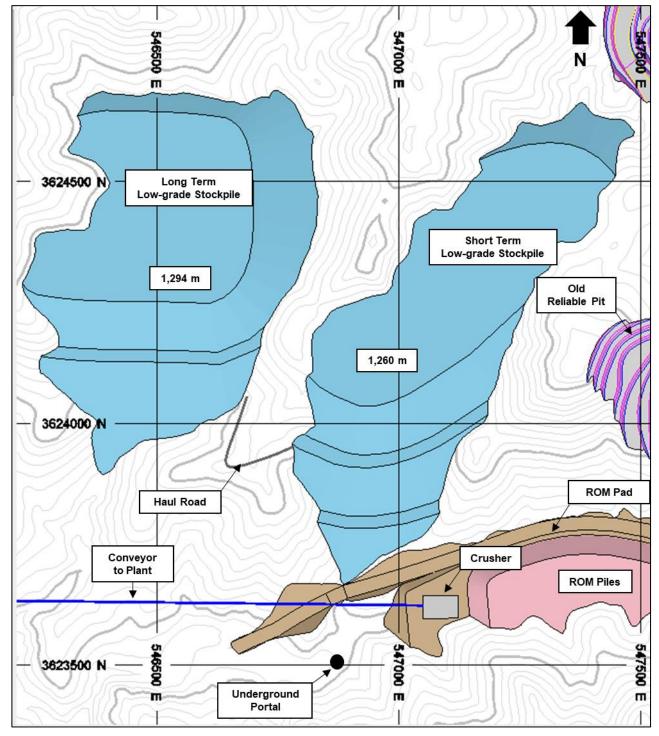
Long-term and Short-term Low-grade Stockpiles, Plan View
